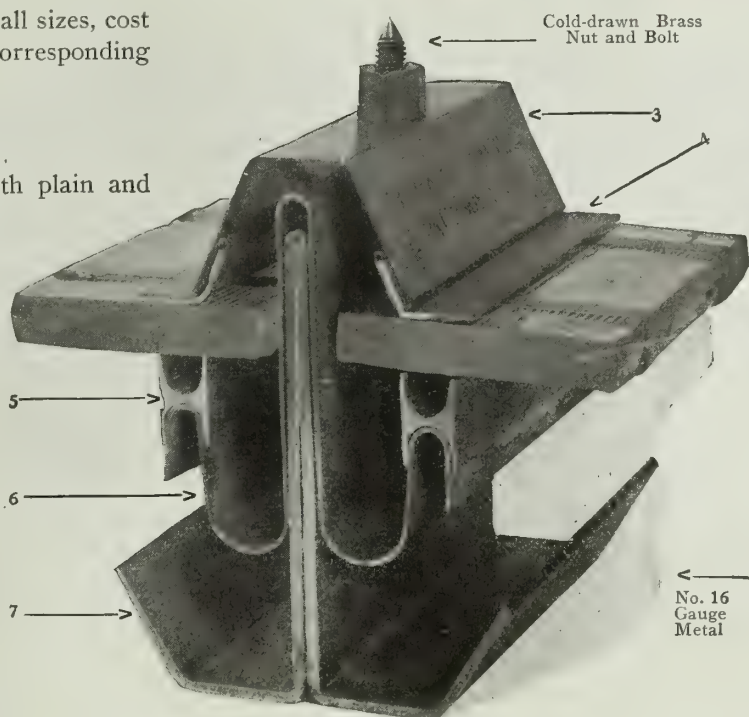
COMPLETE BAR ASSEMBLED, SHOWING THE GLASS AND DETAILS OF CONSTRUCTION
